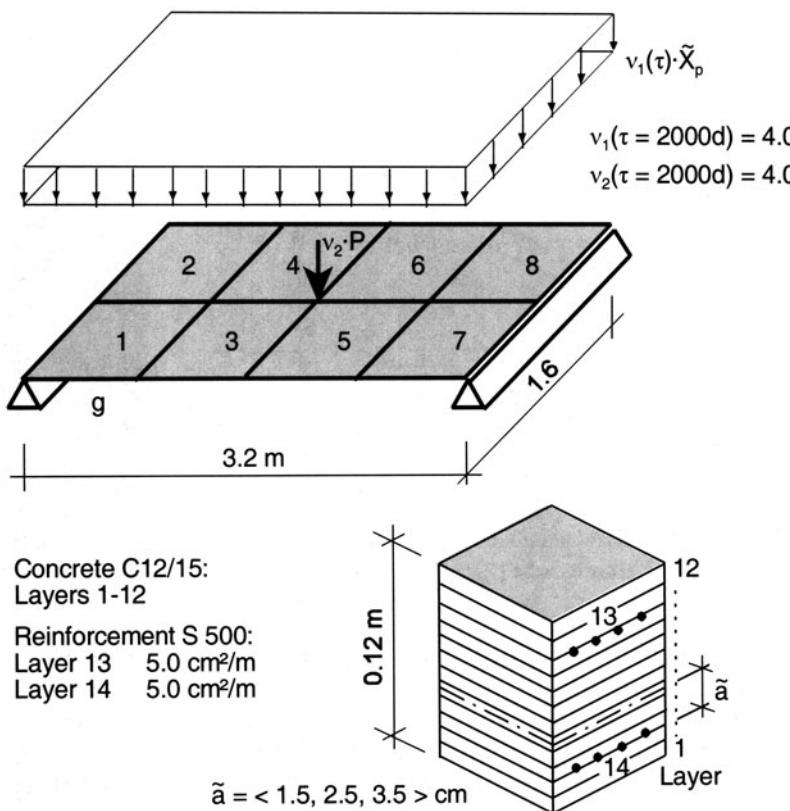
Reinforced-concrete plate; geometry and finite element model
